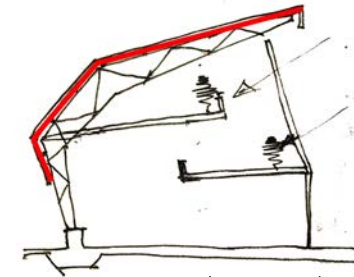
Greenhouse section sketch 5 (Author 2018)
